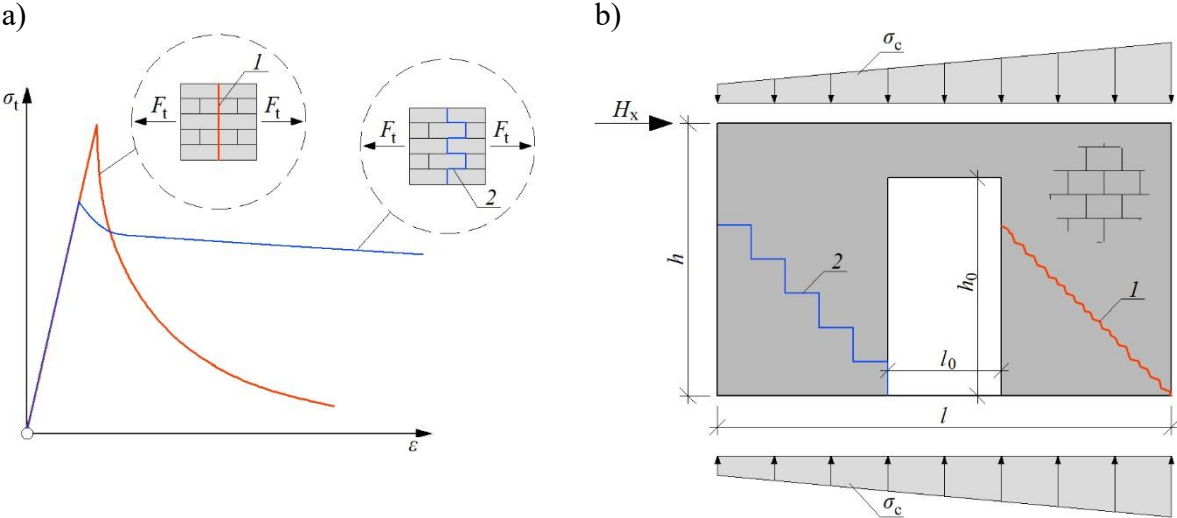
Differences in tensile behavior of masonry: a) straight and stepped crack pattern depends on compressive stress, based on [61], b) behavior of stiffening masonry wall in complex failure mode: 1 – straight crack (high compressive stress), 2 – stepped crack (low compressive stress),  $\sigma_c$  – compressive stress,  $\sigma_t$  – tensile stress,  $H_x$  – horizontal shear force,  $F_t$  – tensile force.
